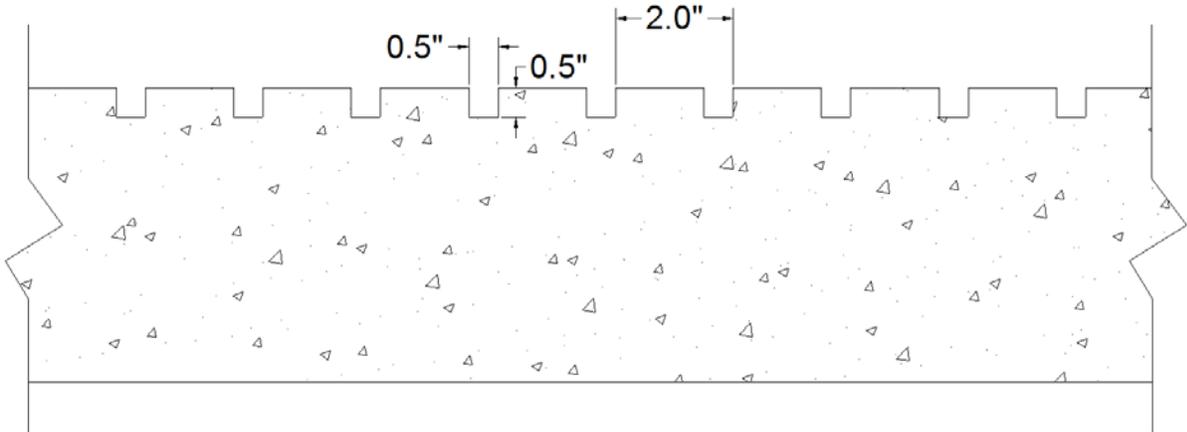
Cross sectional view of a parallel grooved concrete floor with recommended dimensions.
